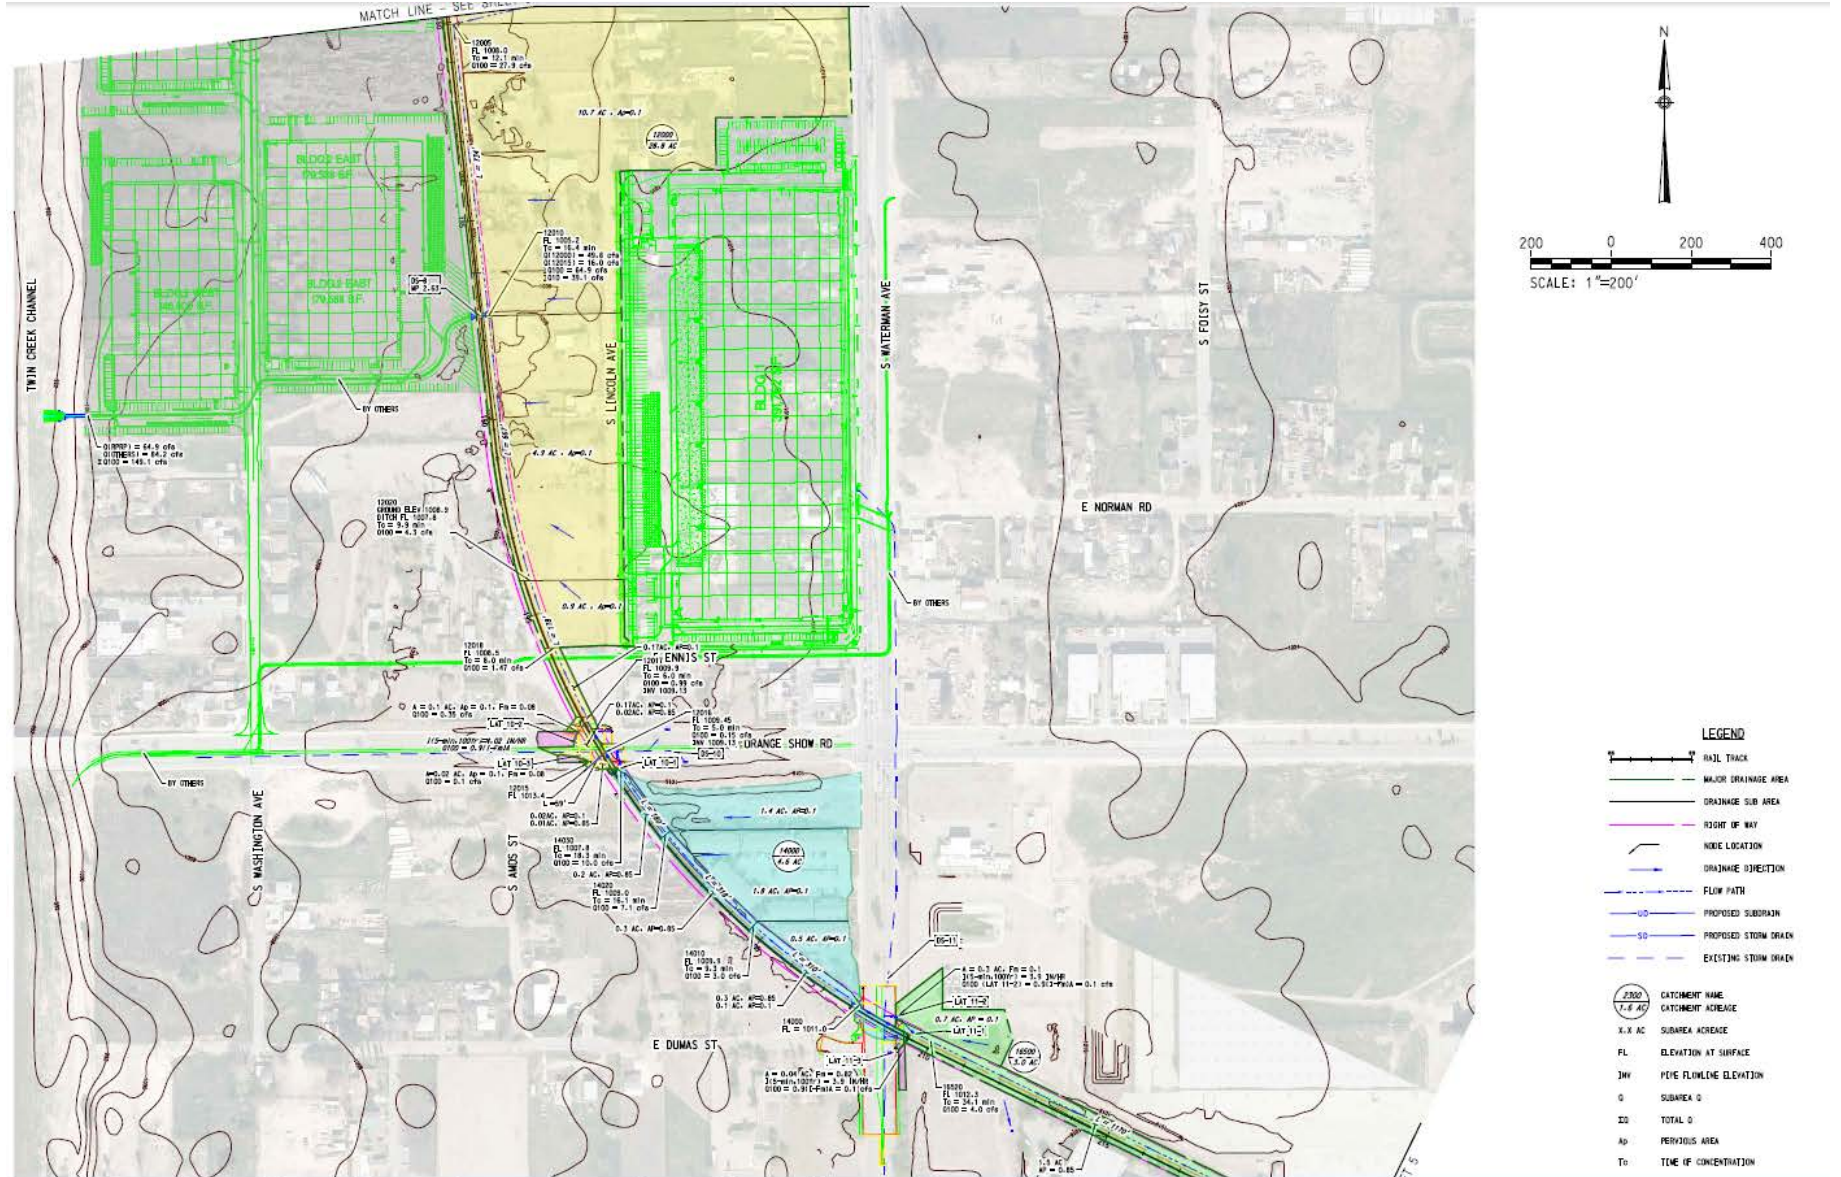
Twin Creek Side Drain Connection: Revised Footprint
